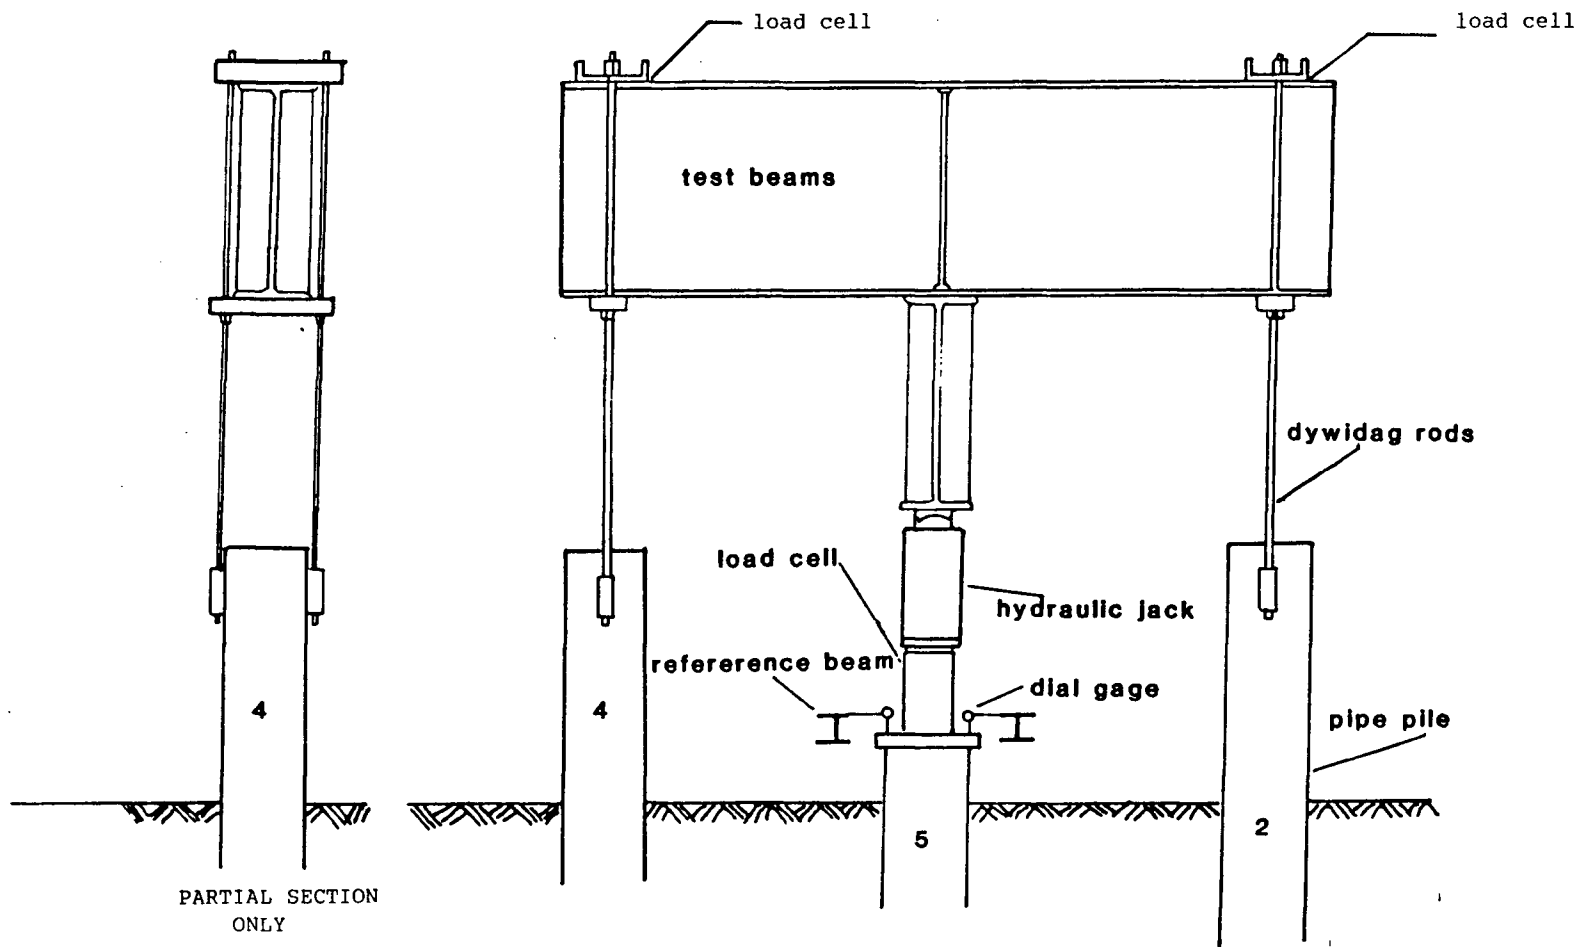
AXIAL PILE LOAD TEST SET UP FOR PILE NO. 5
